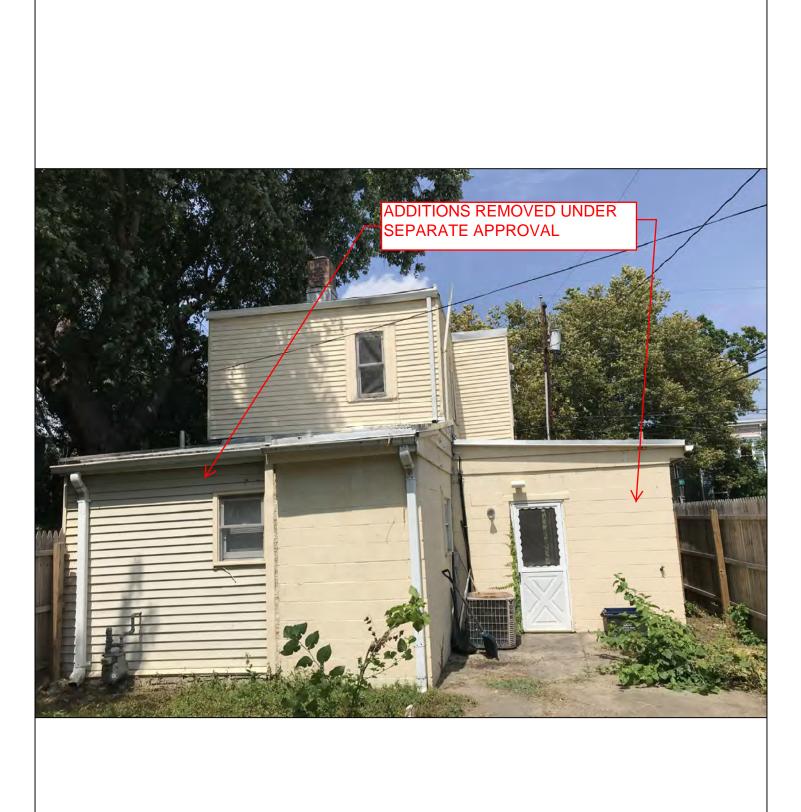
PHOTO OF EXISTING SIDE ELEVATION (JONES ALLEY ELEVATIO	N)	COPYRIGHT ©
